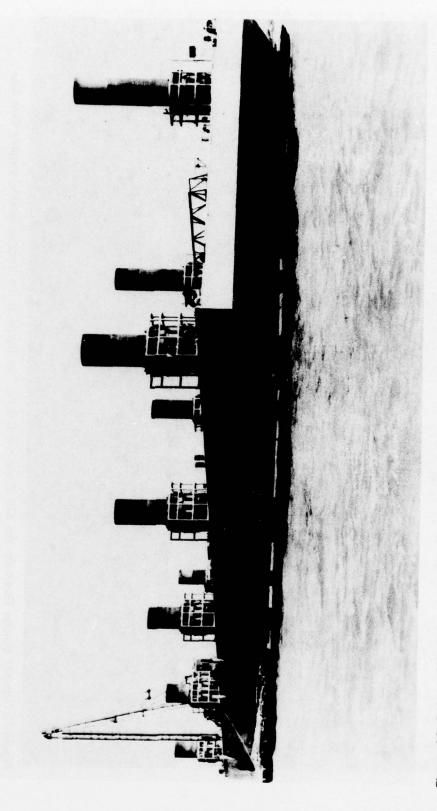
Delong Pier Barge at the Virginia Beach, Virginia Test Site.
